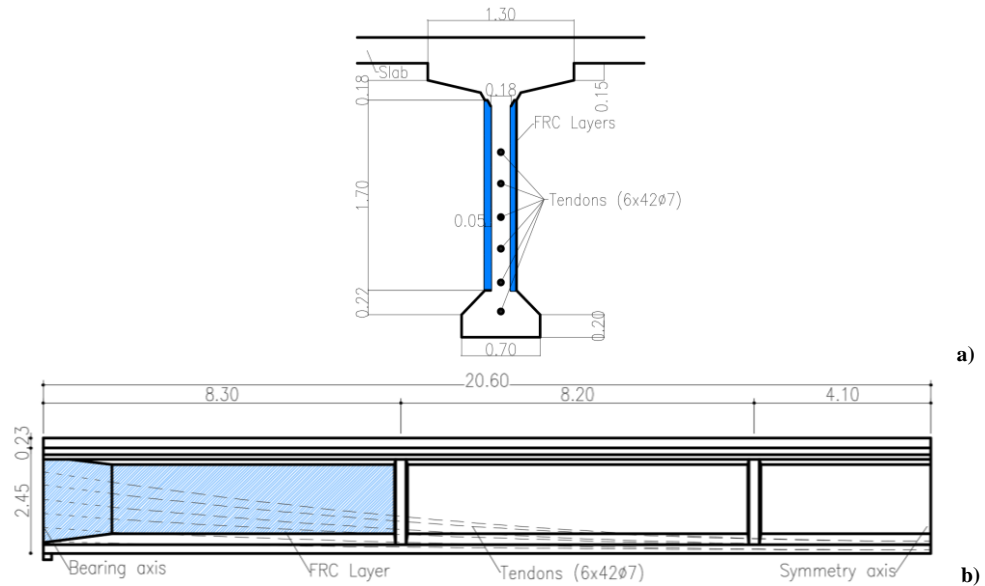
Geometry and reinforcement details of the prestressed beam, with layer of FRC: cross section a) and longitudinal view b).
